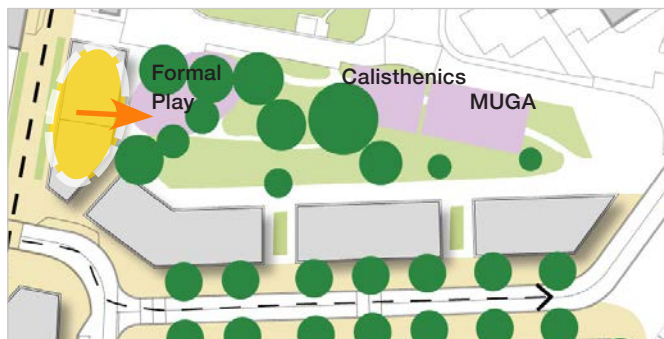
Jubilee Gardens plan – children's and young people's play space; public uses at ground level (such as a cafe) overlooking the Gardens
